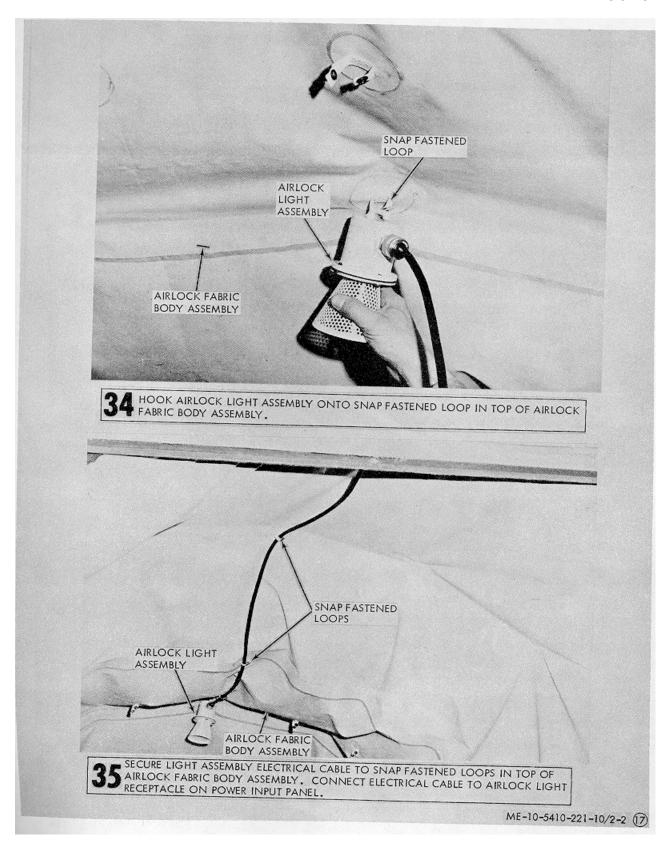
(17). Erection of expandable shelter, (sheet 17 of 18).
